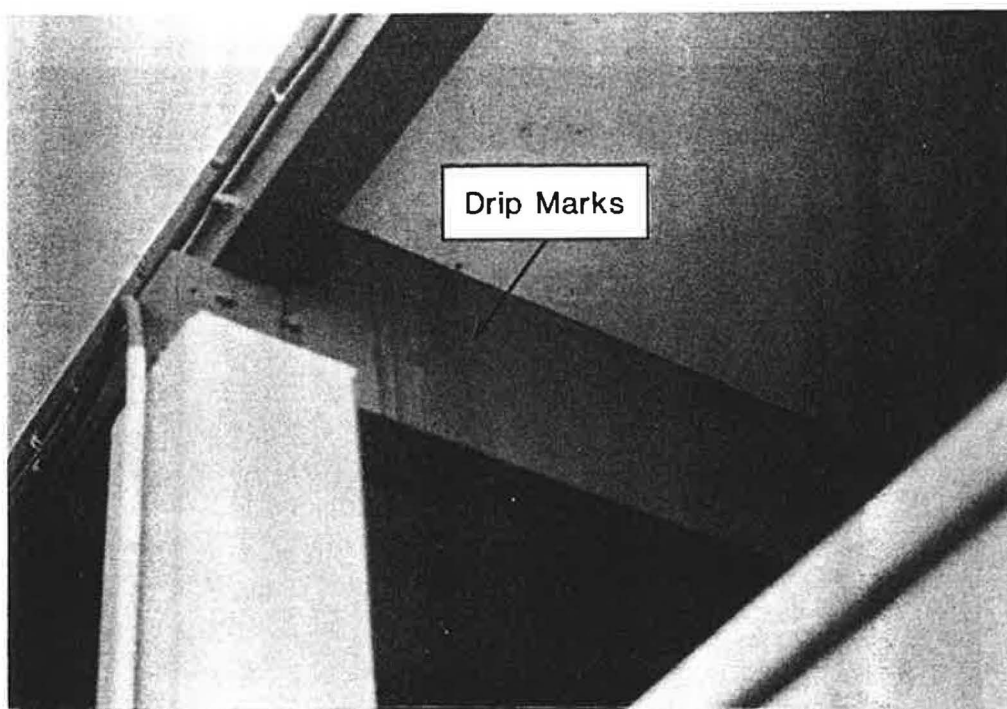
Water leak drip marks on indoor ceiling laminated beam.
